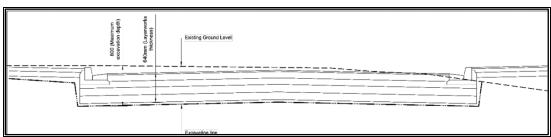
Excavation for road layerworks at depth (source: Walters, 2020)
